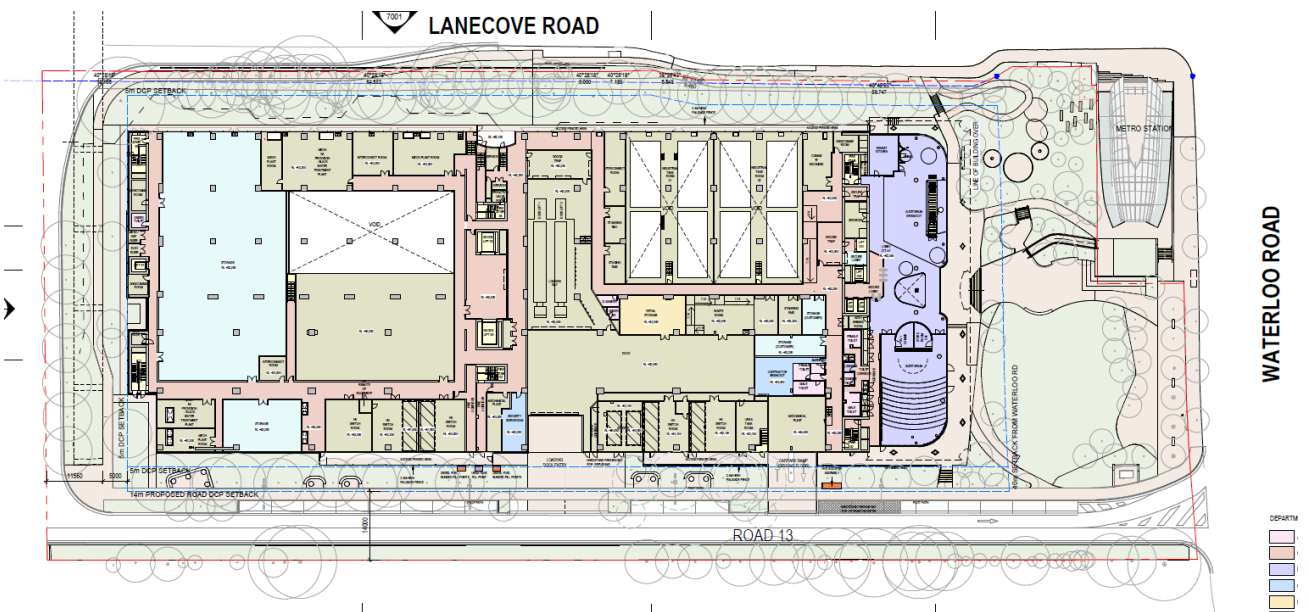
Proposed Level 01 Floor Plan. Source: HDR – August 2025
